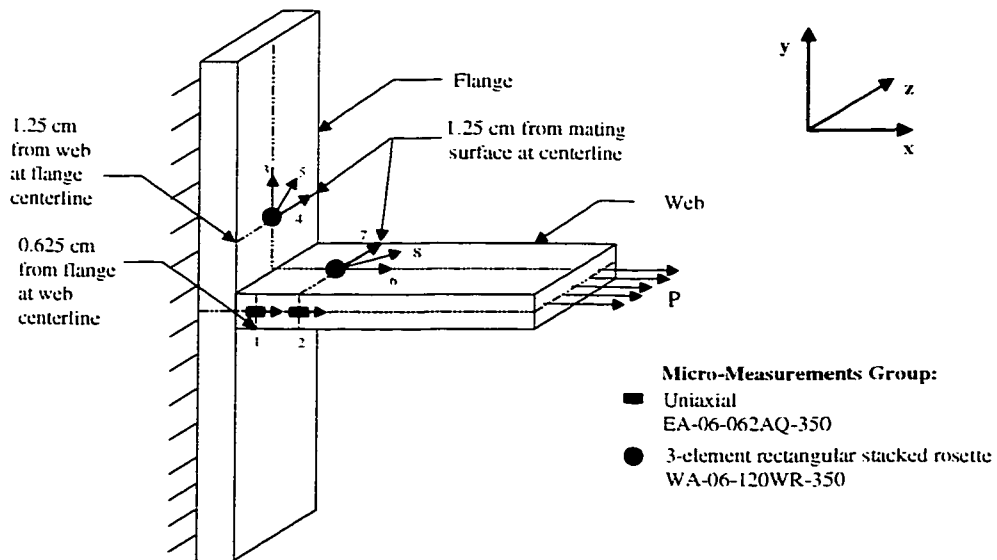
Tension Specimen Instrumentation Layout.
